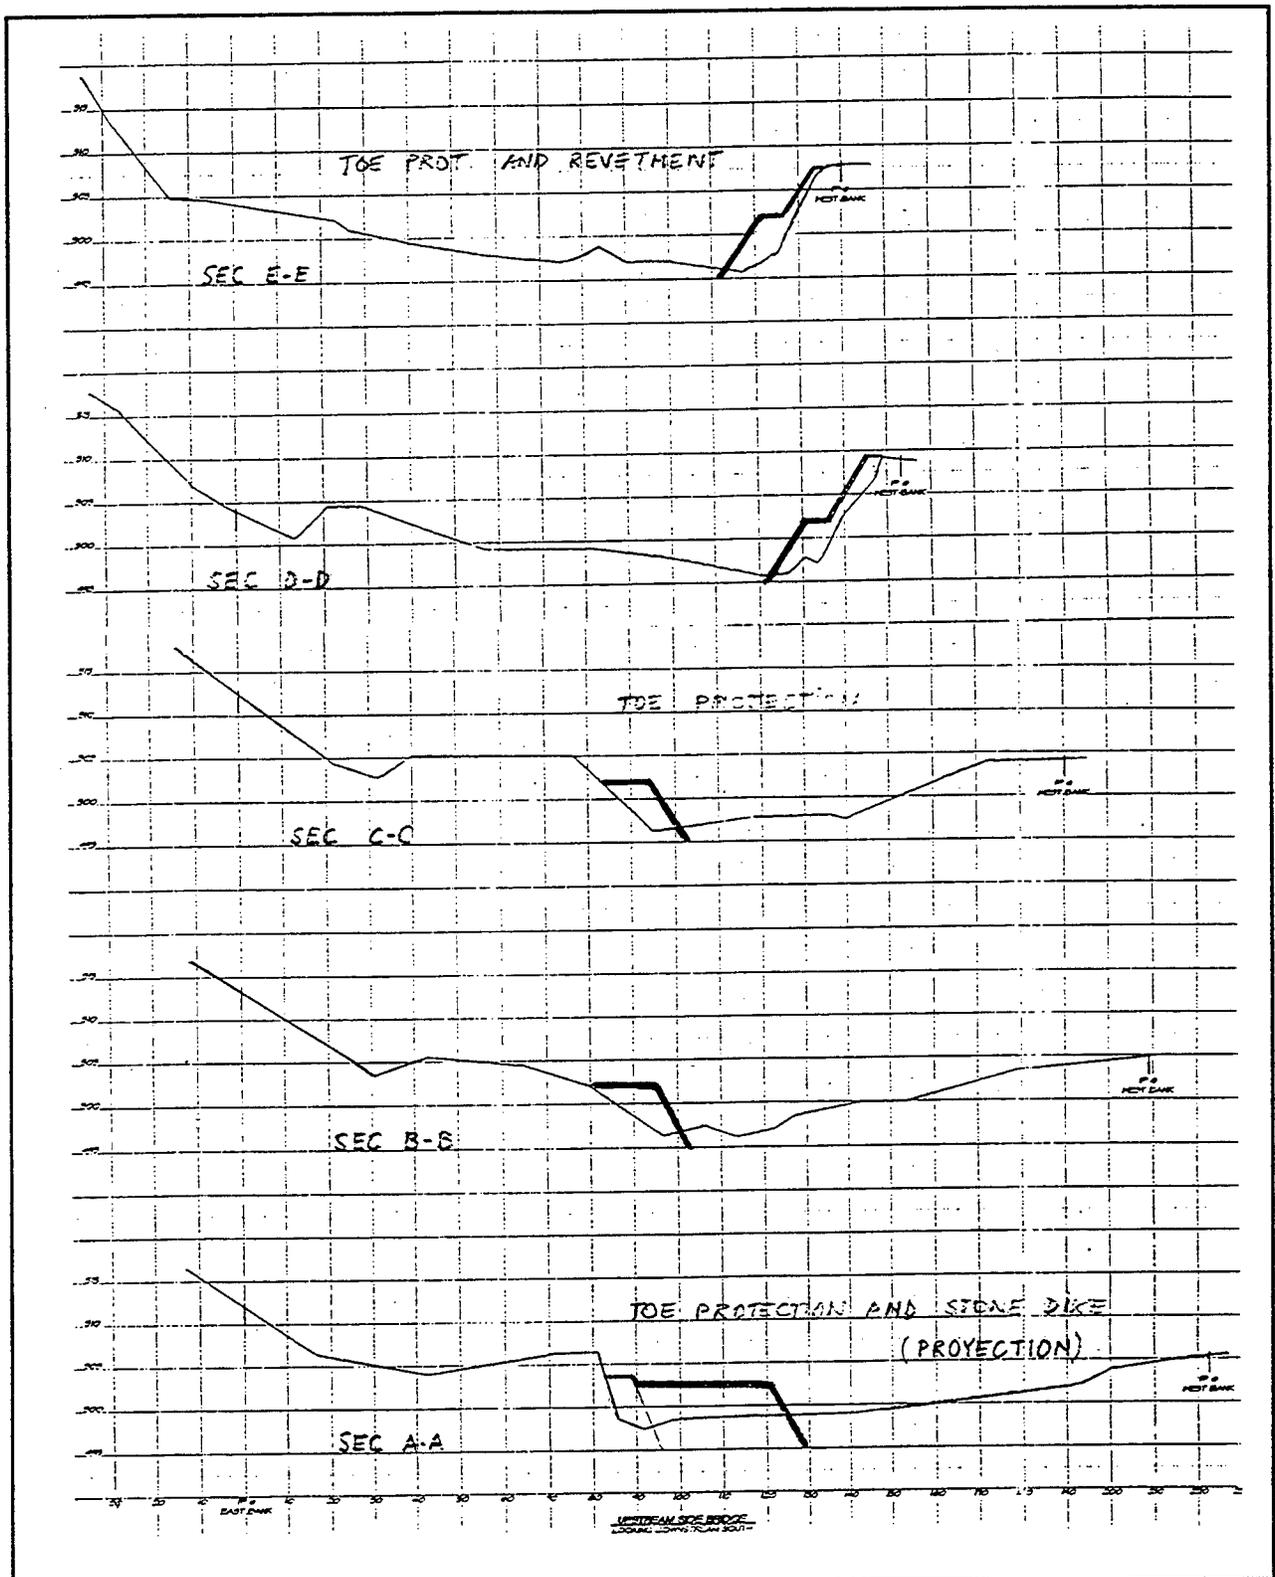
Senachwine Creek site alternative 1 design schematic (cross-section view).
